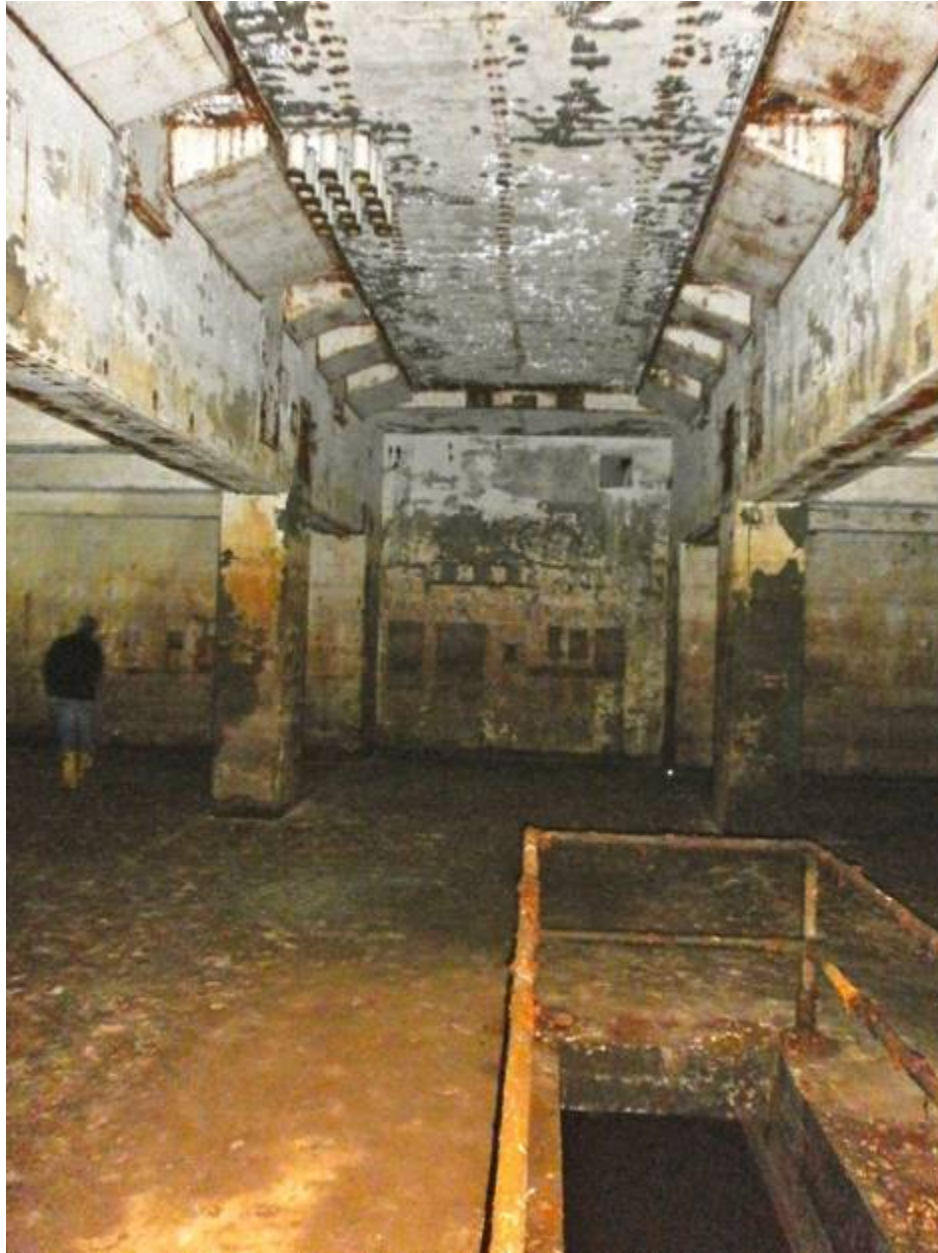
Interior of Magazine A showing position of roof elevator doors, south and north missile storage rooms to left and right and covered-over missile elevator pit, 2013
